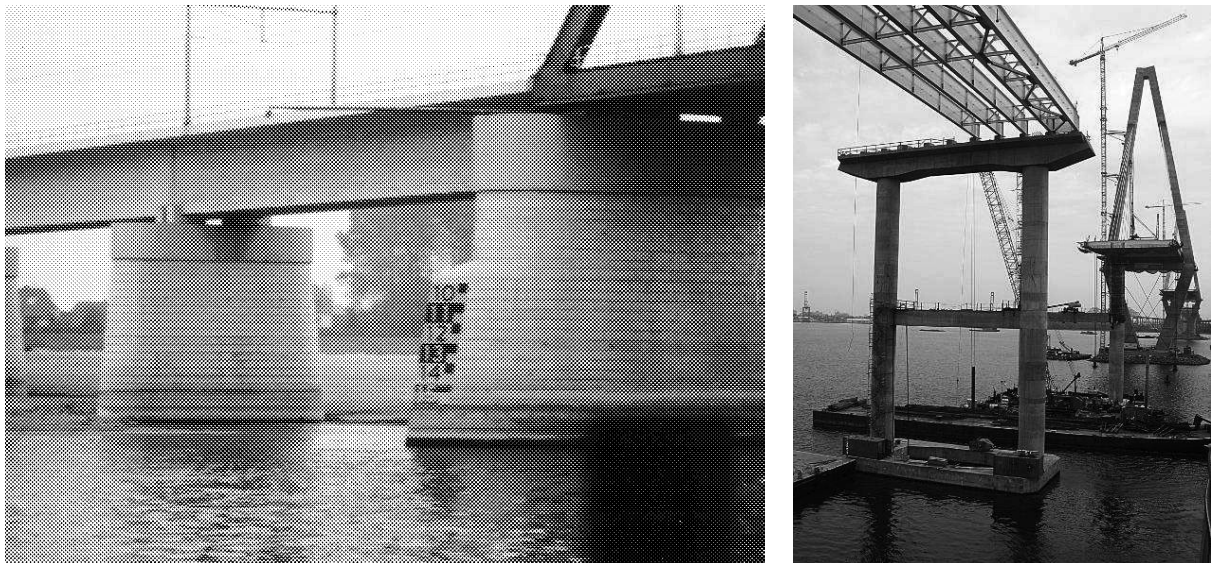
Bridge piers; Masonry pier (left), Concrete piles (right)
